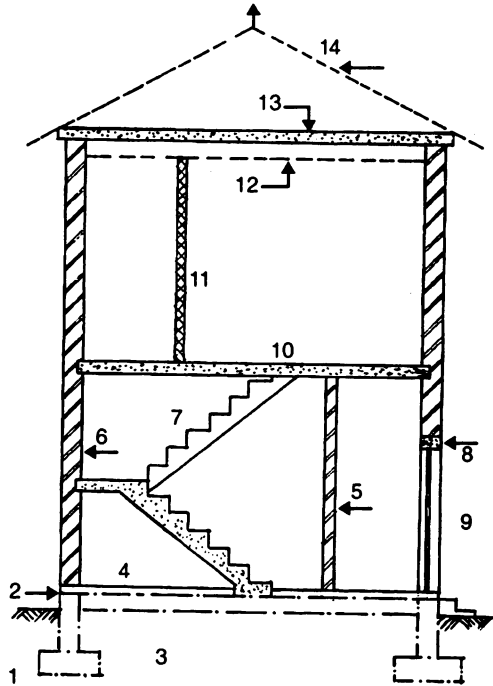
Parts of a building: 1. Foundation, 2. Plinth, 3. Basement filling, 4. Ground floor, 5. Internal wall, 6. External wall, 7. Staircase, 8. Lintel, 9. Door, 10. Upper floor, 11. Partition wall, 12. Ceiling, 13. Flat roof, 14. Sloping roof.
